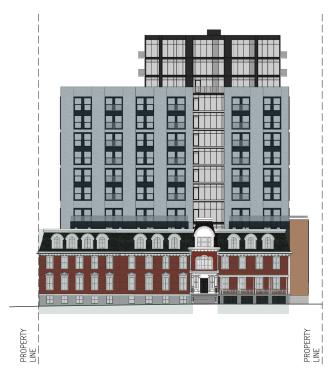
Rhythm of bays along Victoria Hall and the new building
